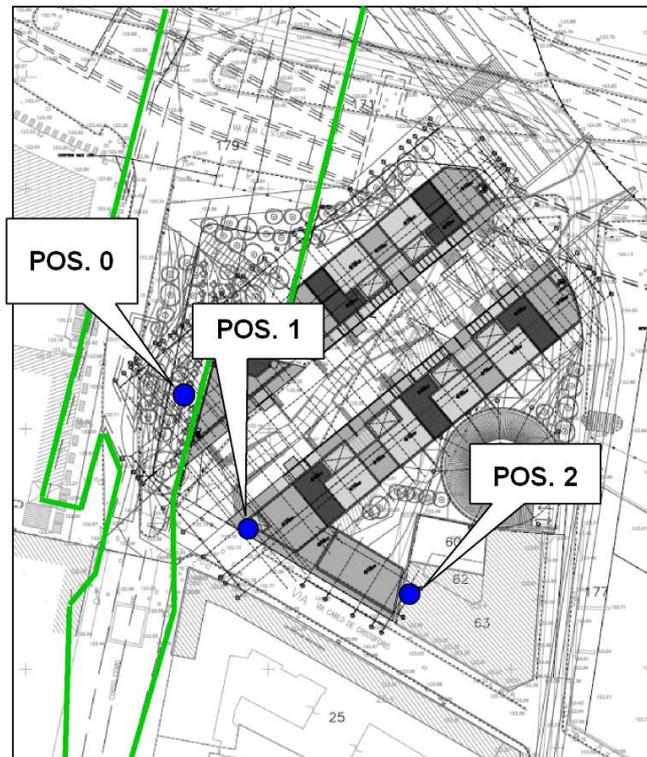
Plan view of the new buildings and of the existing tunnel (green outline)
